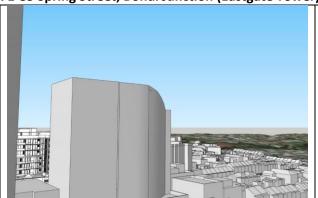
View towards subject site (to the far left) from RL115.75 eye level standing at mid tower level of Eastgate West Tower showing DA approved envelope (source: applicant's submission)
